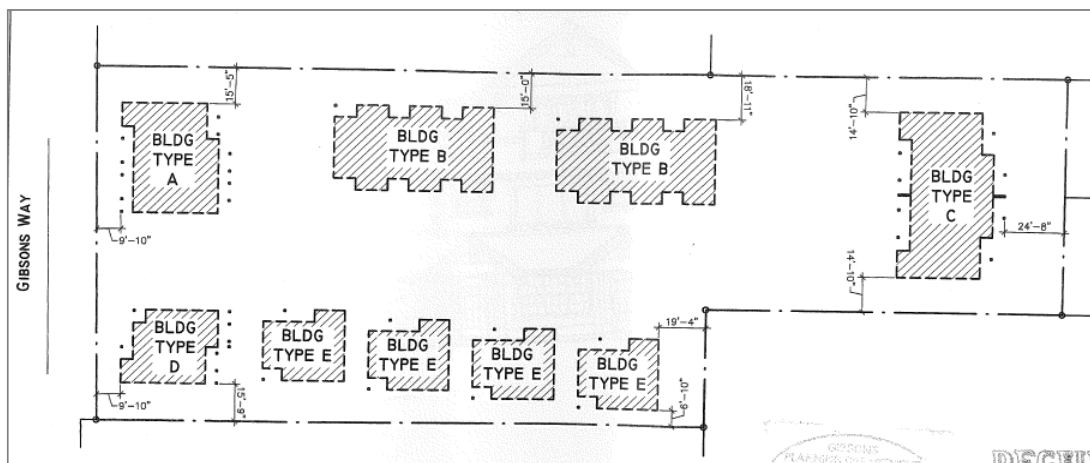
Site plan for previously approved multi-family development at 728 Gibsons Way
